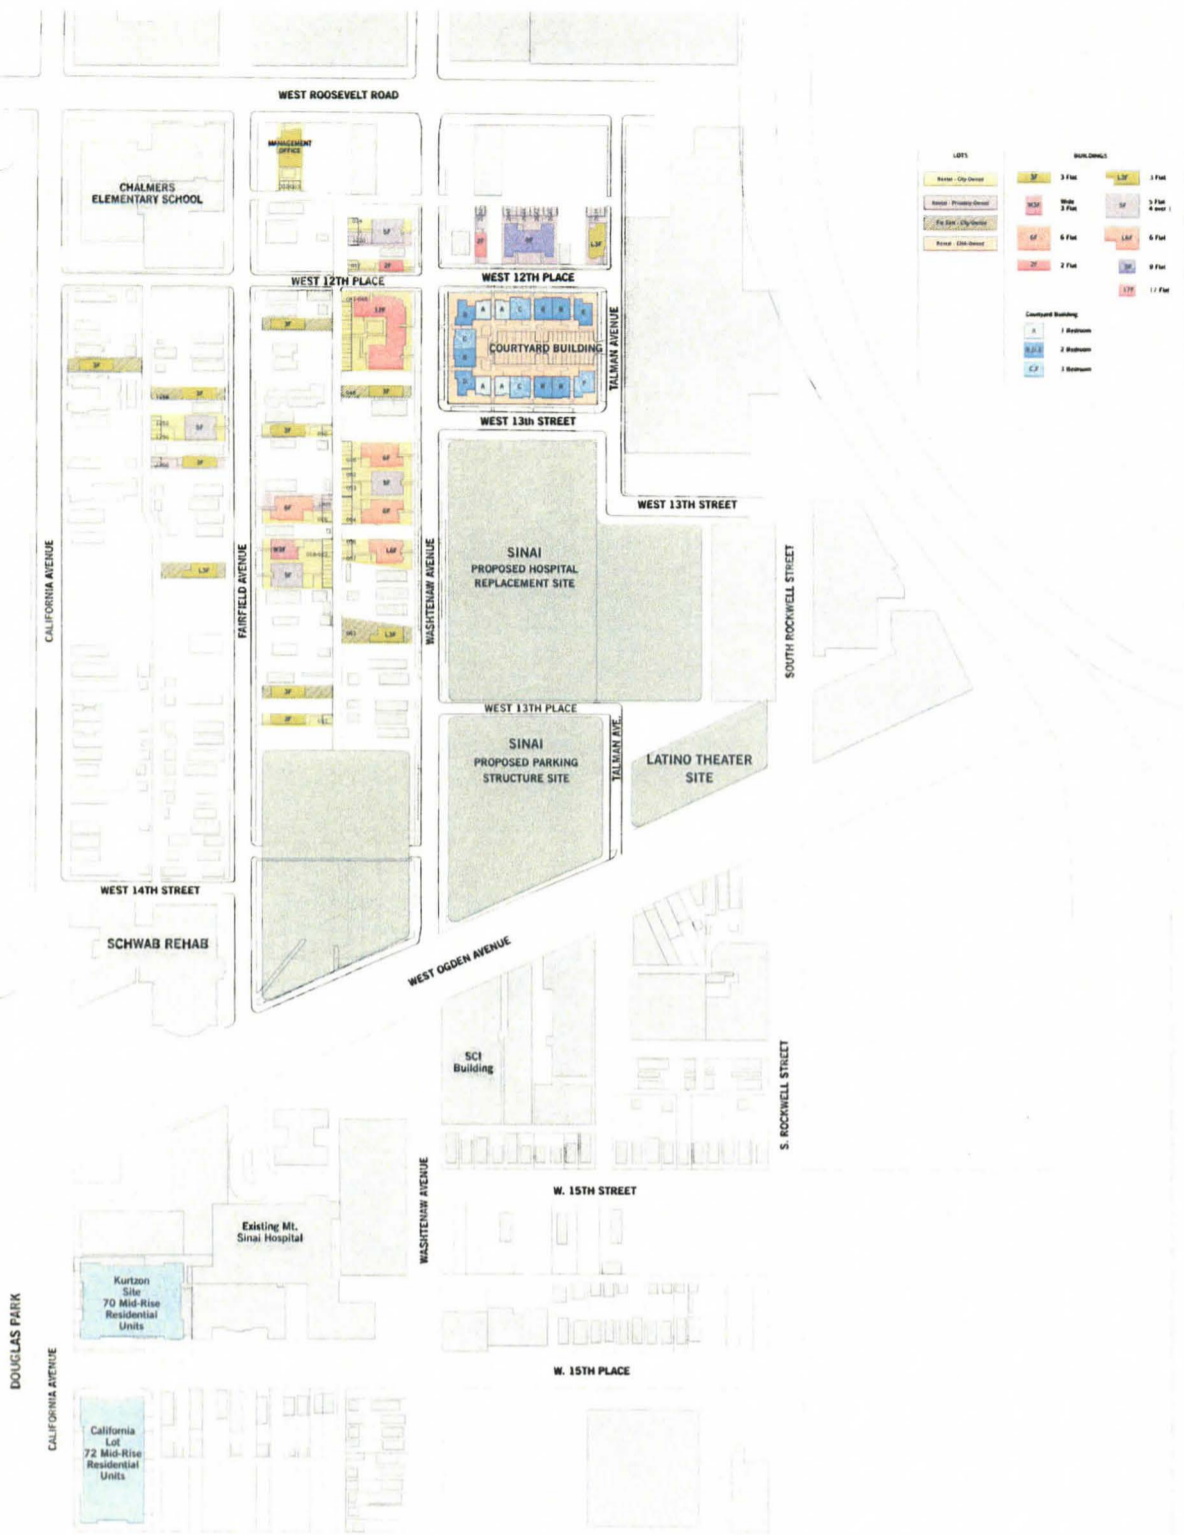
Park Douglas Phase 1 Area Site Plan
